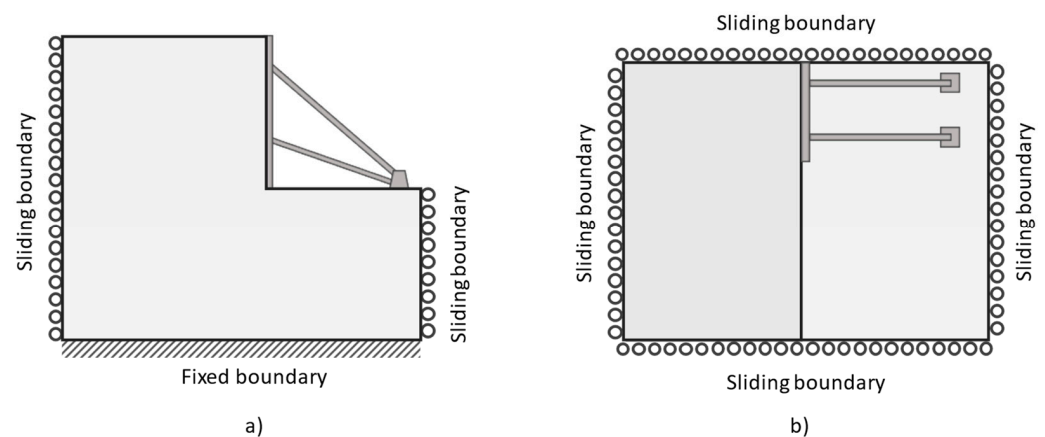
Schematic representation of the numerical model boundary conditions. (a) Elevation plan and (b) floor plan.
